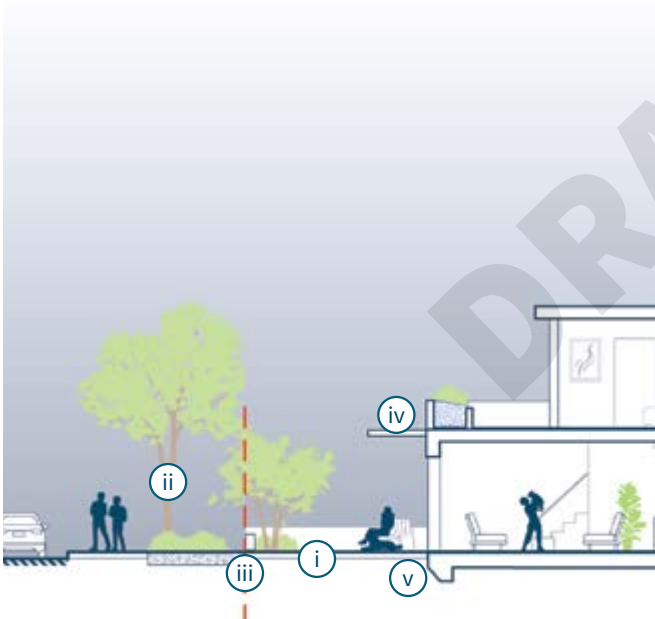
Front garden setback with veranda and planted garden area improve privacy and avoid overlooking from the street.
